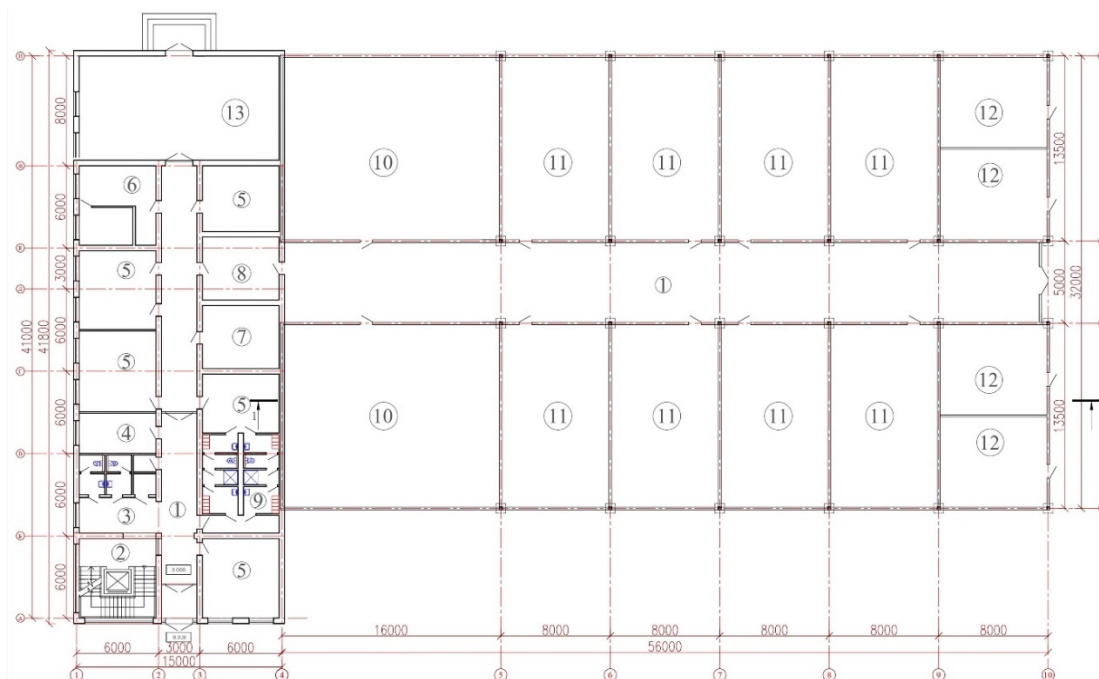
Plan of the first floor of the phytotron-greenhouse complex:
